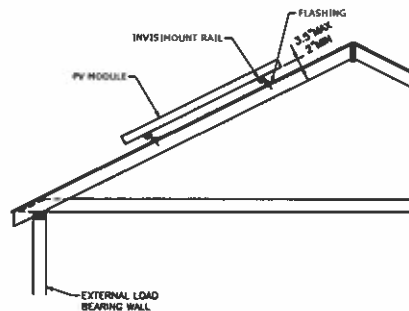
INVISIMOUNT ROOF ATTACHMENT DETAILS @ TRUSS / RAFTERS
